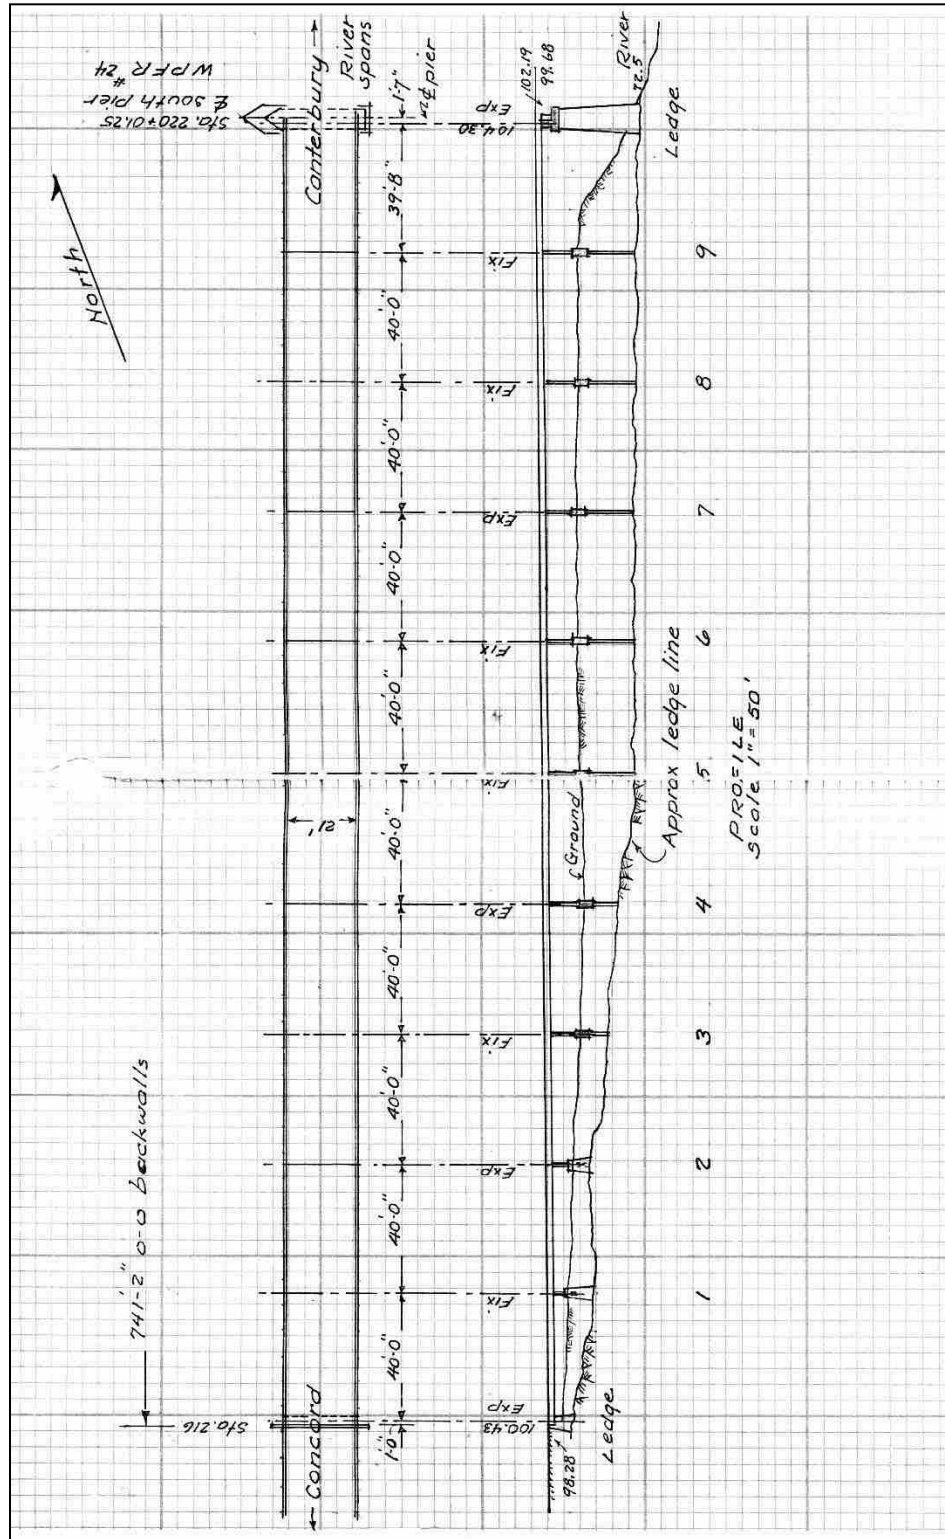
Sewall's Falls Bridge, plan, elevation of south approach trestle built 1937. Field inspection sketch made by NHHD engineer Wendell H. Piper, May 15, 1942 (NHHD Bridge Inventory Card, Concord 070/117).
